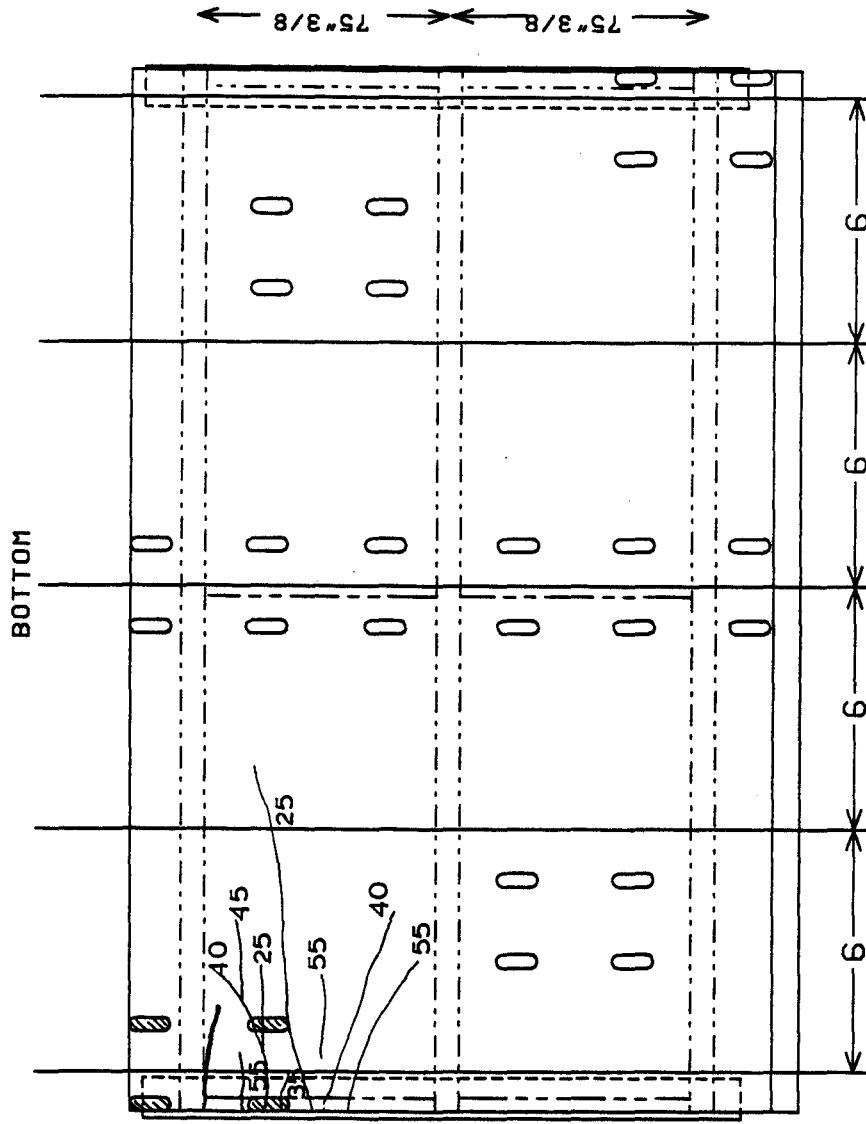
Bottom Cracking Pattern (Second Bridge - Test No. 5)
